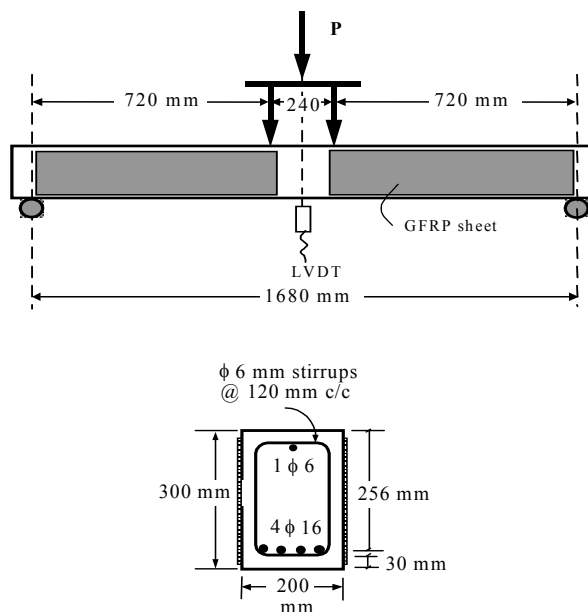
The beam set-up and its cross-section for shear testing. (*First Series*)
